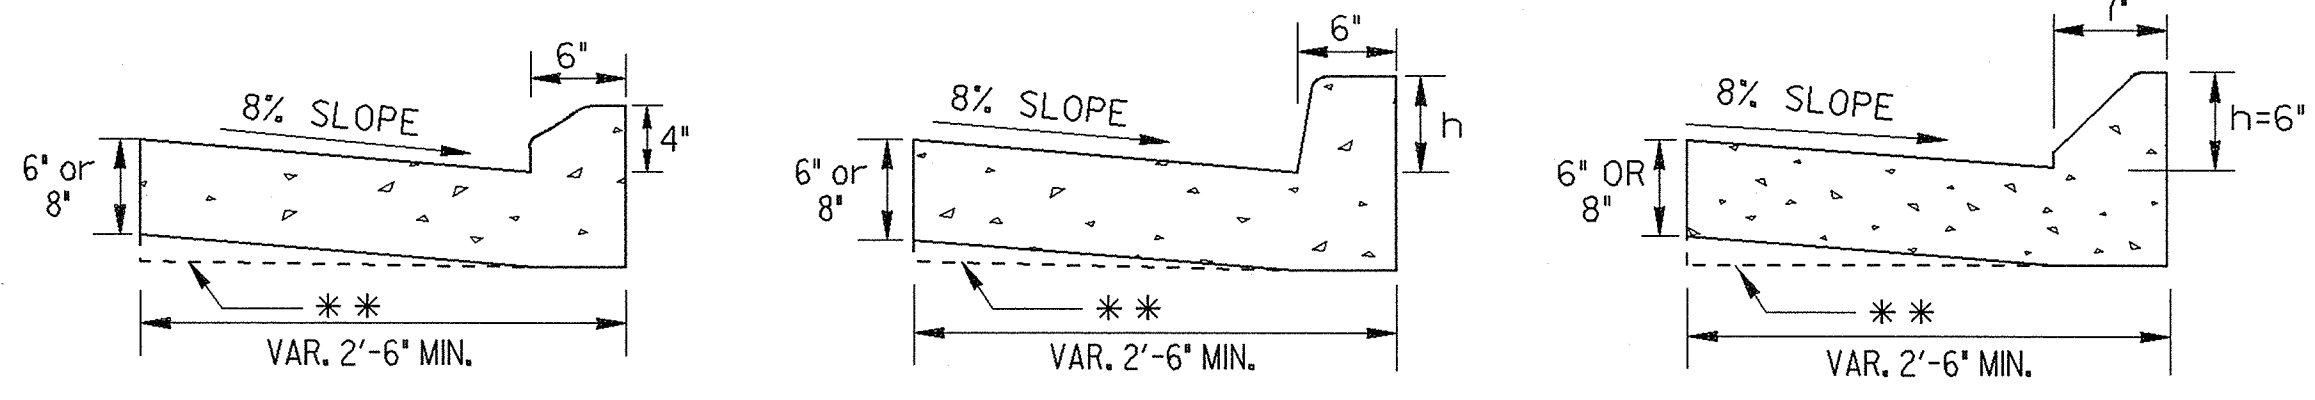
DETAILS OF RECESSED CURB FOR DRIVEWAYS
